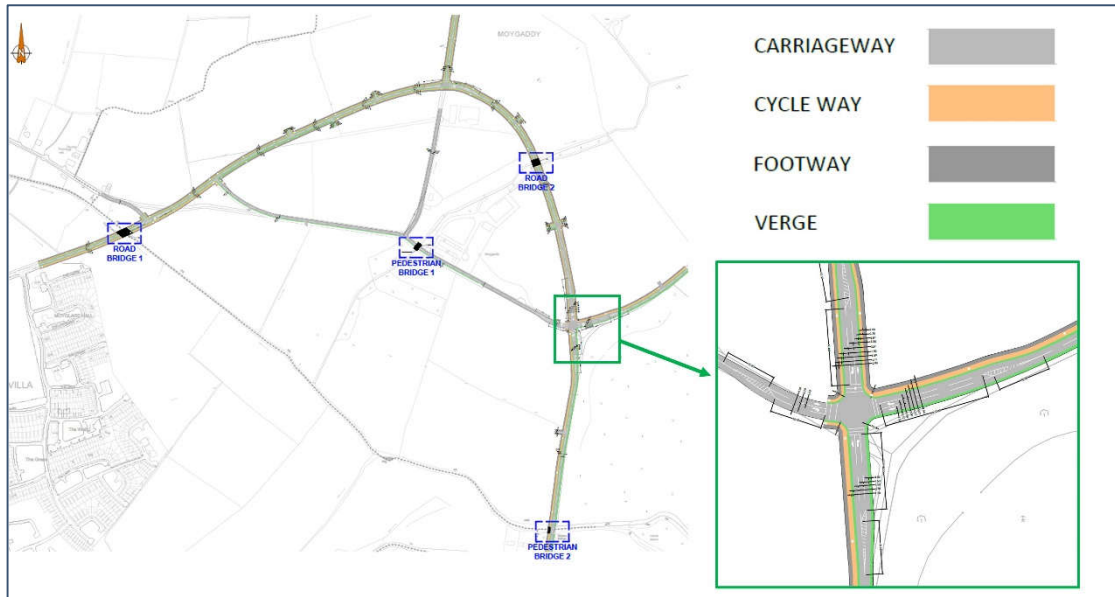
Route of the MOOR and an example of new proposed Junction/Crossroad adjacent to Site A – Imagery extracted from Planning Drawings (OCSC, 2022)
